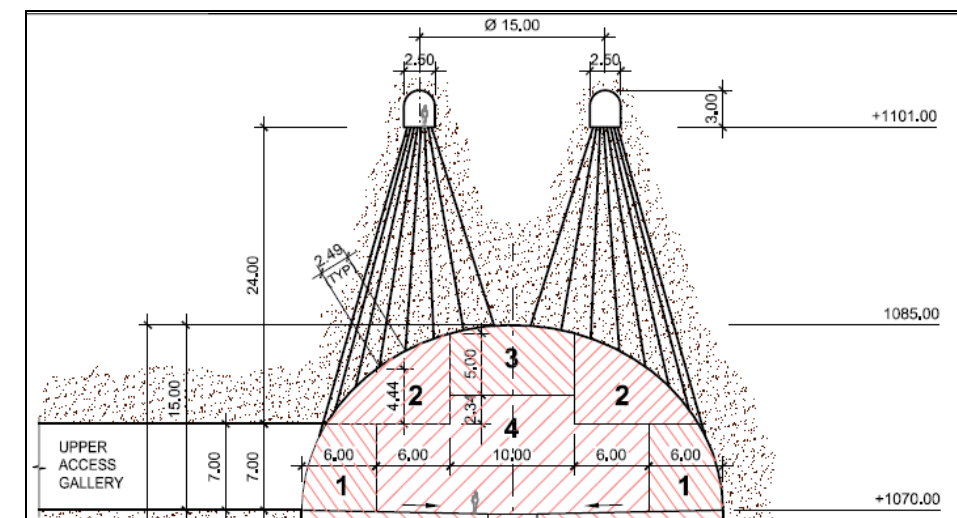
Pre-reinforcement of the LENA cavern roof
